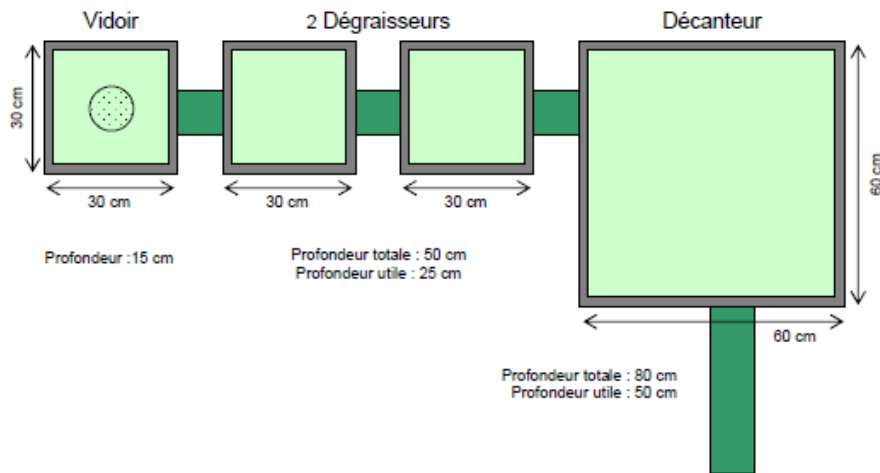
Plan view of household facilities used on settled sewer systems in Senegal (source: ENDA RUP)
